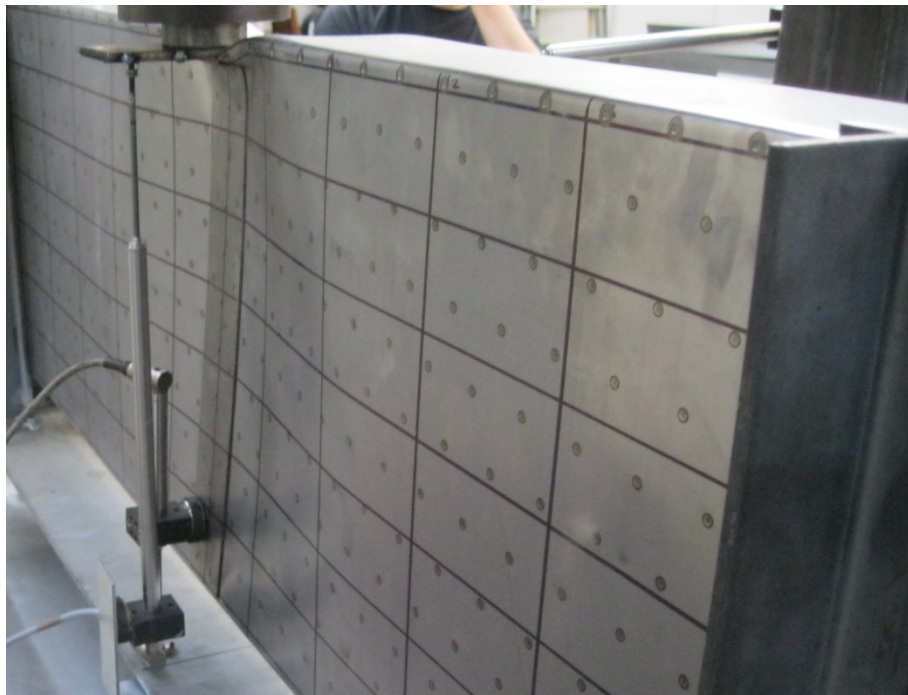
Beam 5 back view (flat 0.75 mm + structured 0.50 mm)
